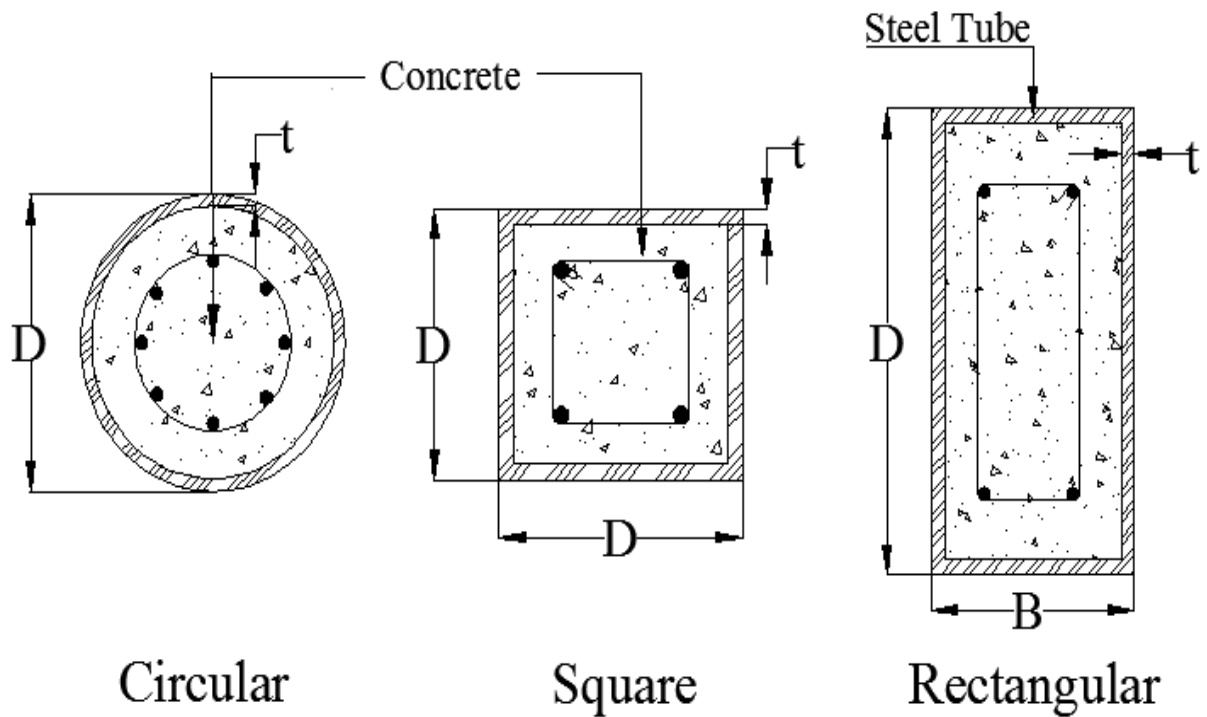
Reinforced concrete filled steel tubular (RCC-CFST) core configuration
